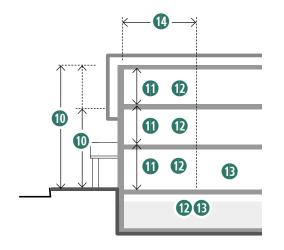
D-4. Commercial Manor Building: Building Siting
